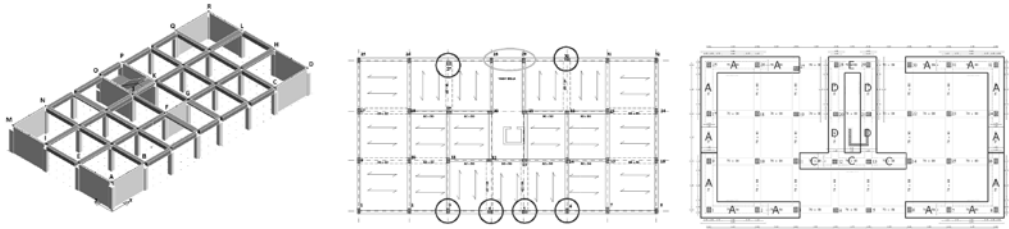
Traditional operations: walls insertion, joints strengthening, foundation widening.
